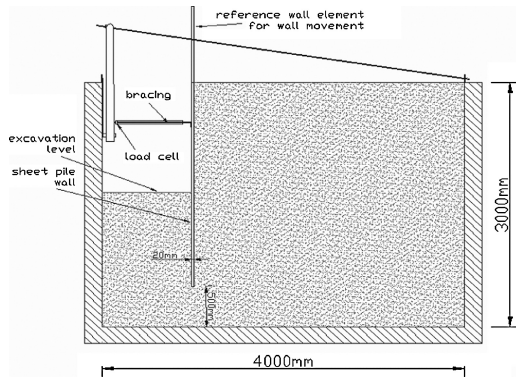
Section through the model showing the extended wall element and strut arrangement.
